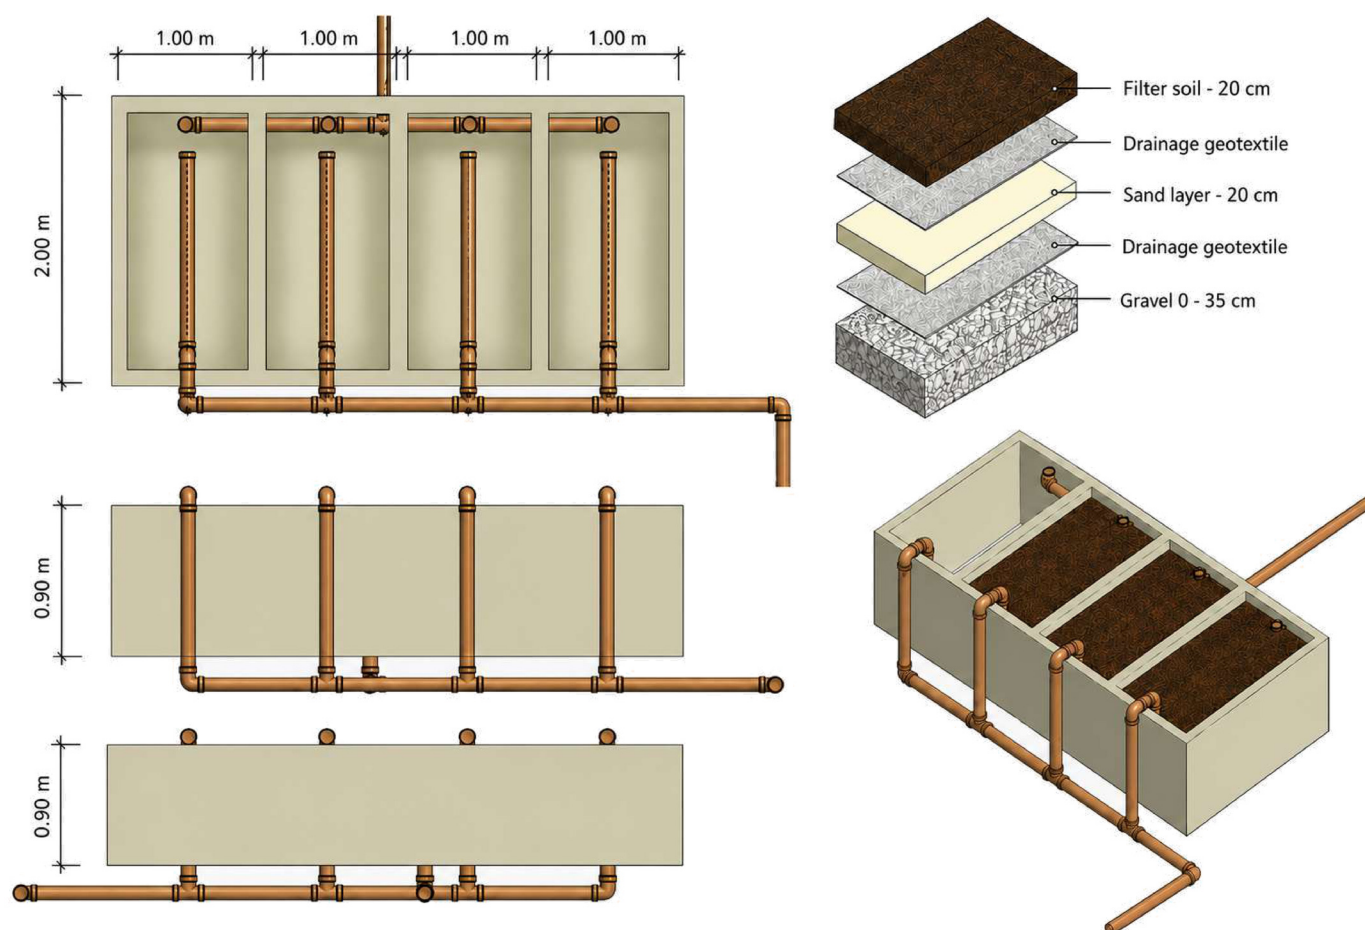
Construction details of the CW tank: floor plan, rear and front elevations, and exploded isometric view indicating the filter layers.
